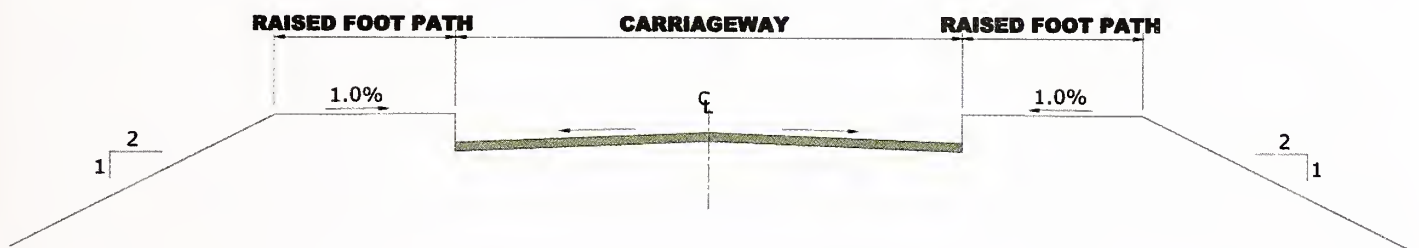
A Typical Cross-Section of Road with Double Camber Provided in a Kerbed Carriageway (Urban Situation)
